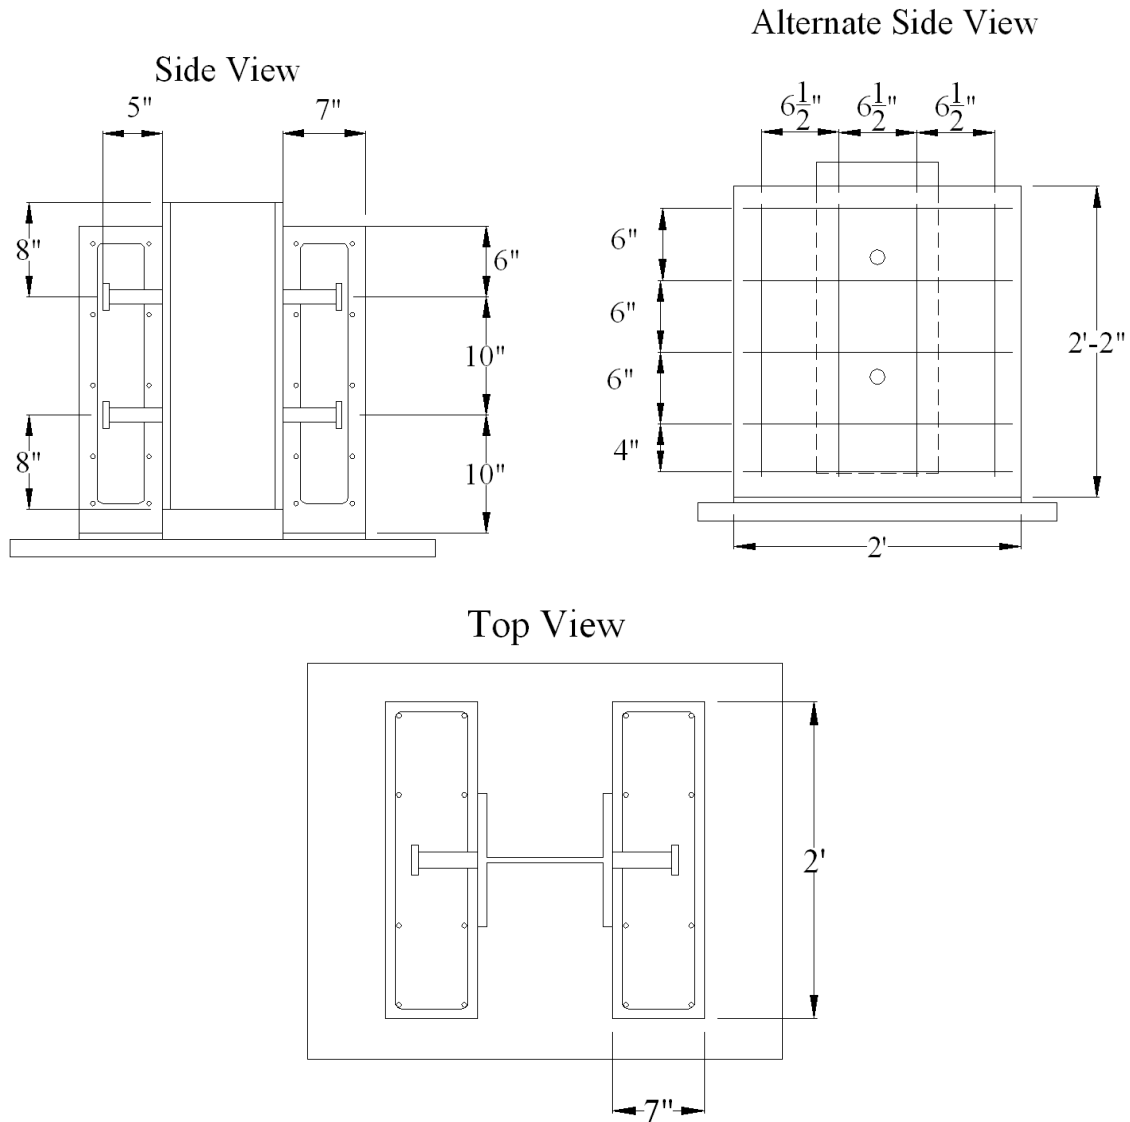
Design of 1 1/4"-Diameter Push-out Specimen
